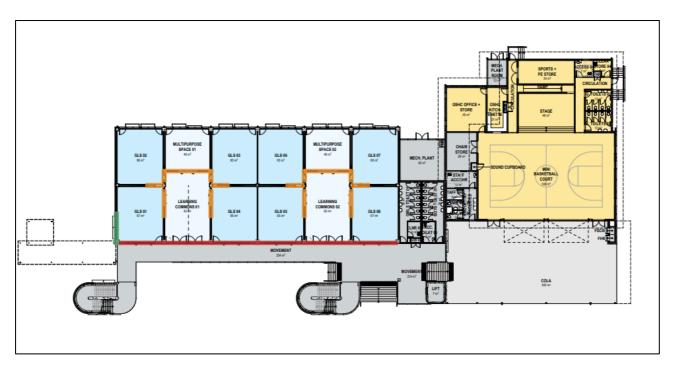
Proposed Ground Floor Plan (Fulton Trotter Architects, 2025)
